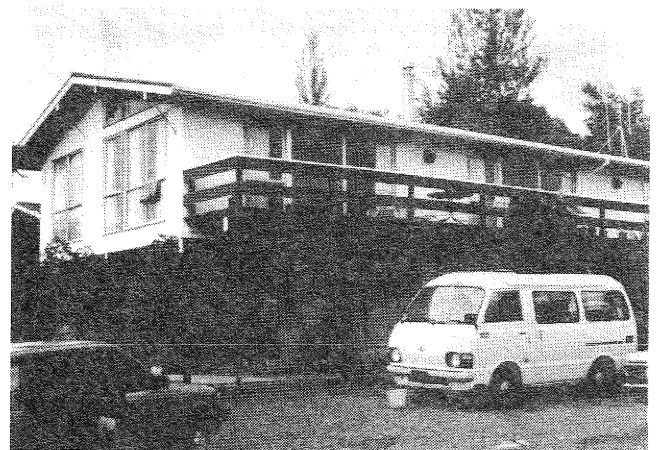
An irregular lower storey, half on concrete block and half on cantilevered posts and beams. Failure occurred at the connections of the beams to the block walls.
